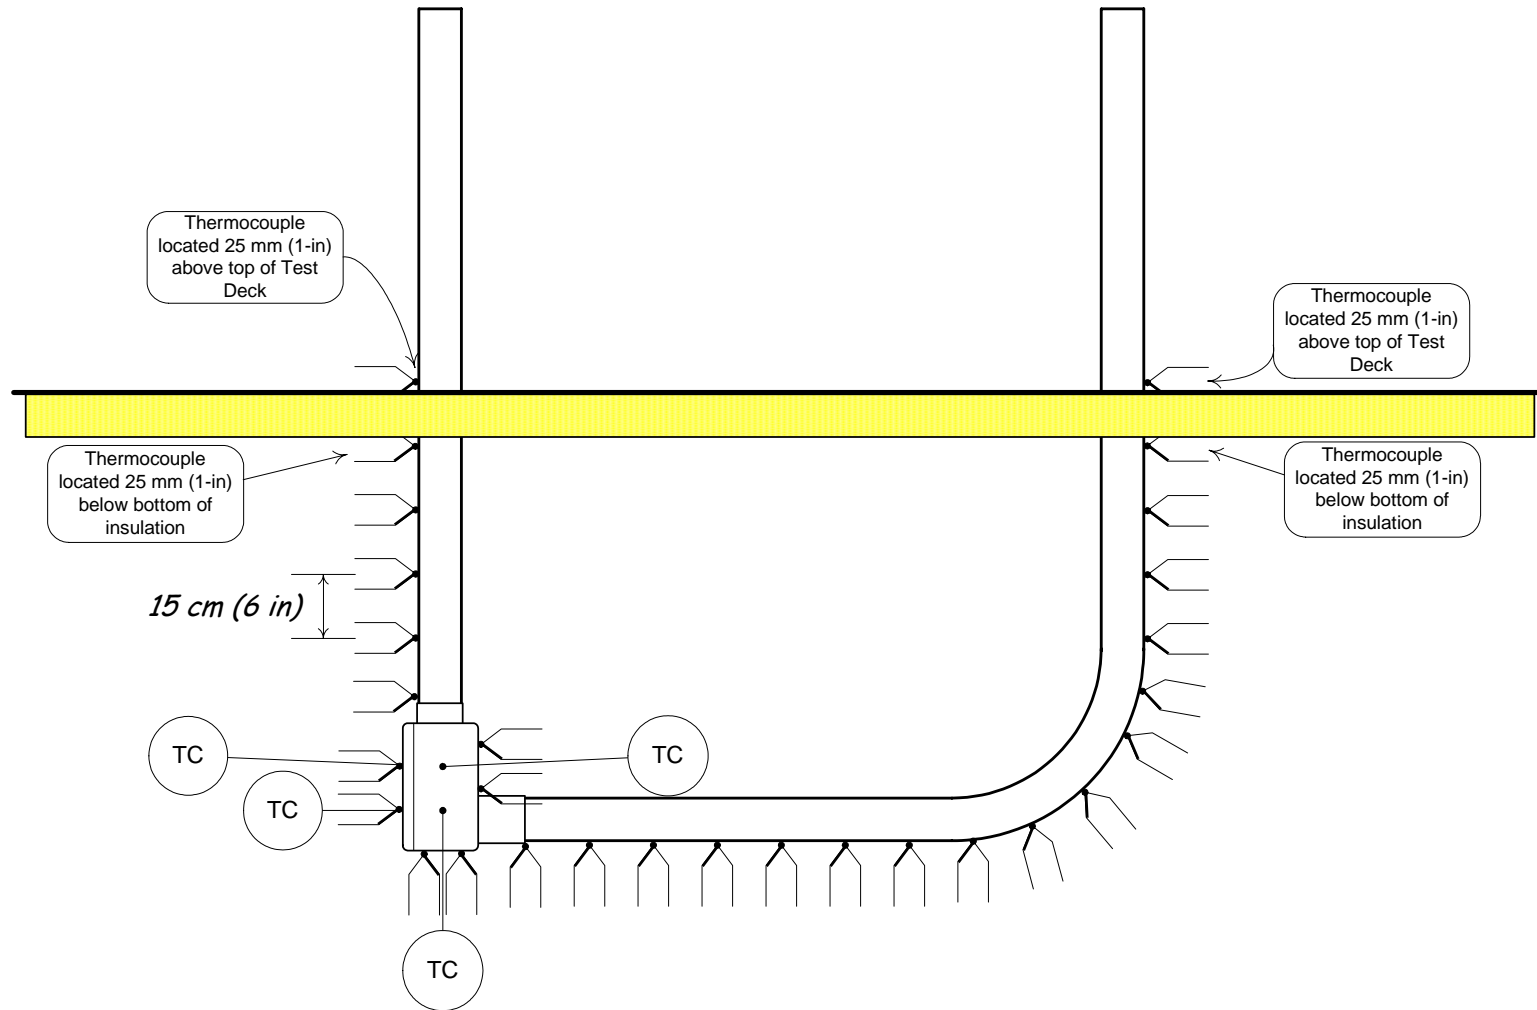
Thermocouple placement on 103-mm (4-in) conduit test specimens (additional thermocouples to be attached—at 150-mm [6-in] spacing intervals—to a bare #8 copper wire routed through conduit).
